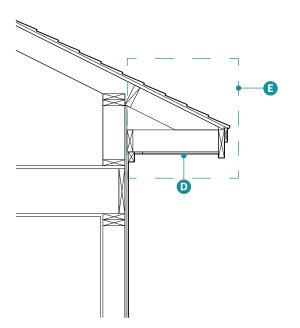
Section Detail of Highest Eave for Pitched Roof
